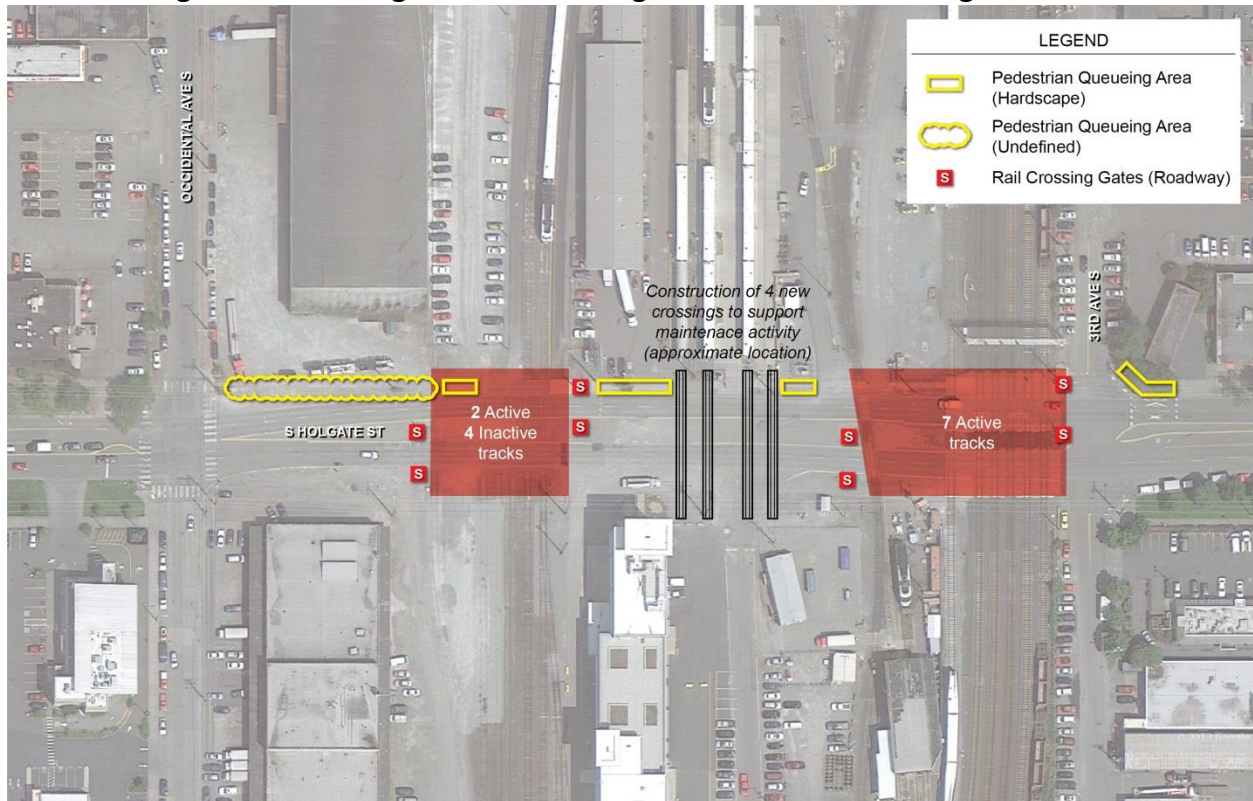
shows additional train crossings planned by Amtrak and located just south of the inspection pit tracks that currently terminate on the north side of S. Holgate Street. These tracks will provide access to a planned service building. These tracks are anticipated to service Amtrak trains during the late night hours and thus have not been assumed to add to the train crossing activity along S. Holgate Street during the evening commute peak hour.
